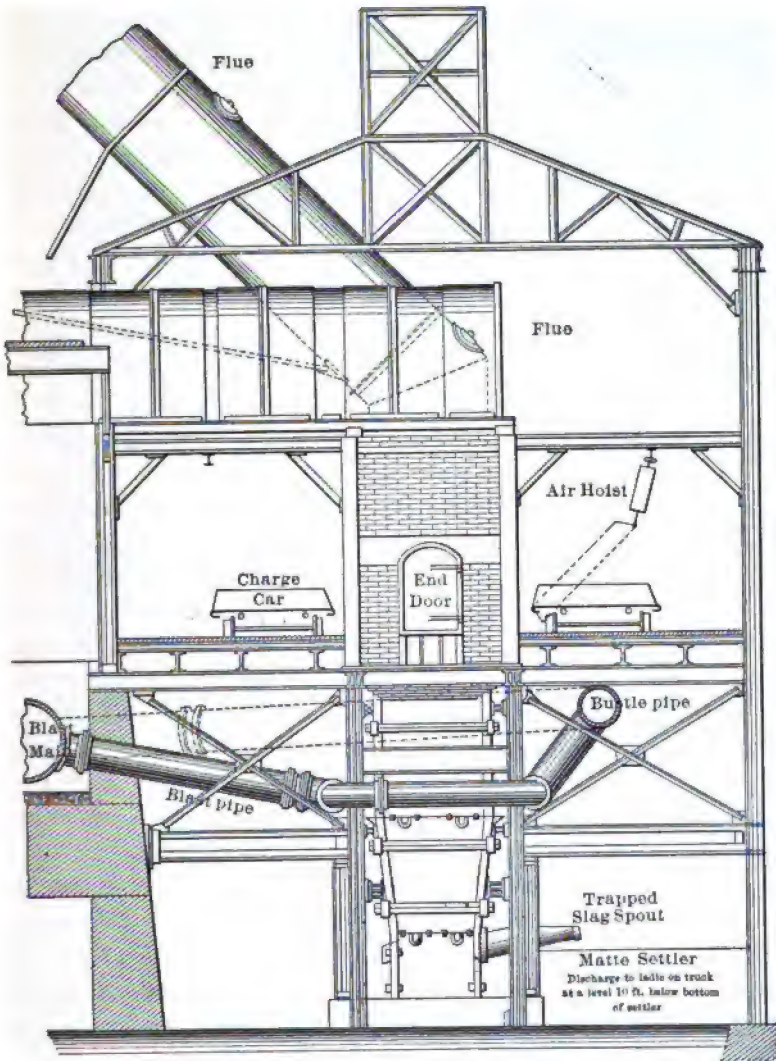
CROSS-SECTION OF FURNACE BUILDING AND THE ELEVATION OF 56- BY 612-IN. BLAST-FURNACE.
